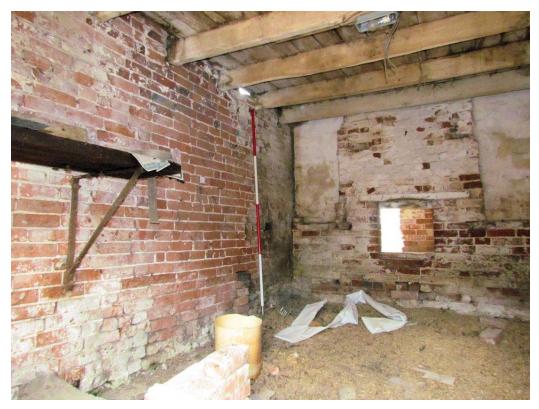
Interior of Bay 1, Looking West (Scale = 2m).
